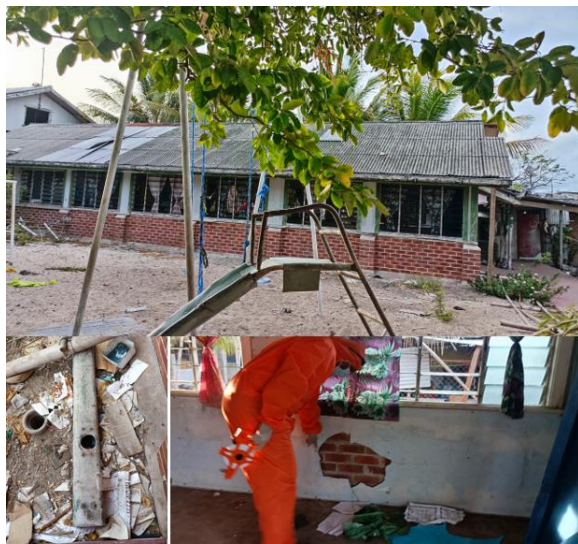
Former Maternity ward; photo on bottom right shows broken internal wall cladding and ACM drainage piping on bottom left
